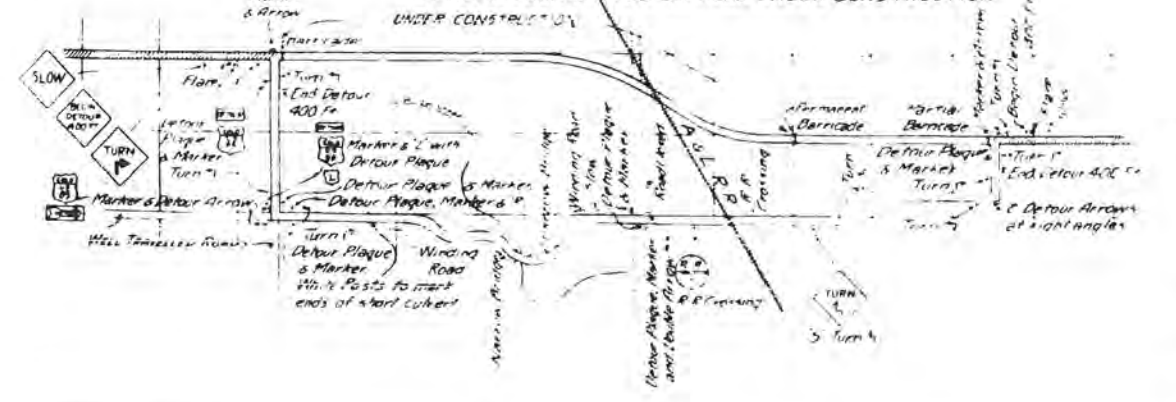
DETAILS OF ROAD UNDER CONSTRUCTION SIGN
